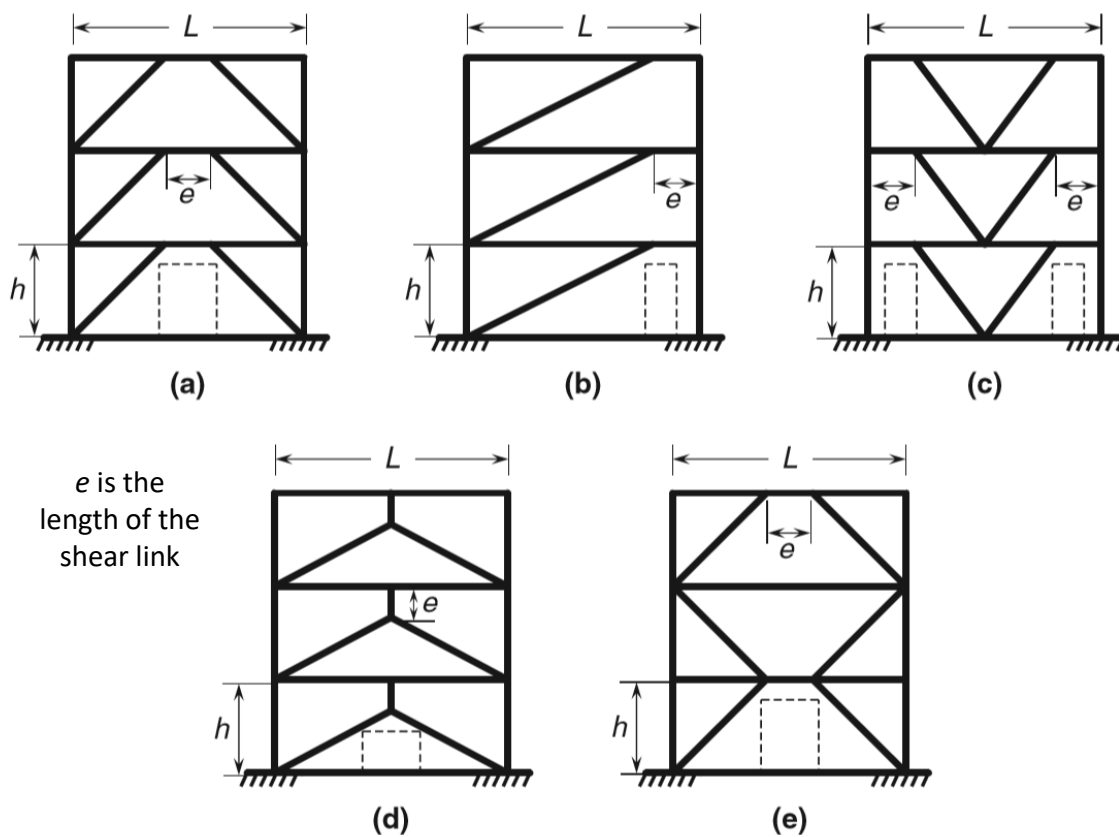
Typical configurations of Eccentrically Braced Frame (Bruneau, et al. 1998.)
